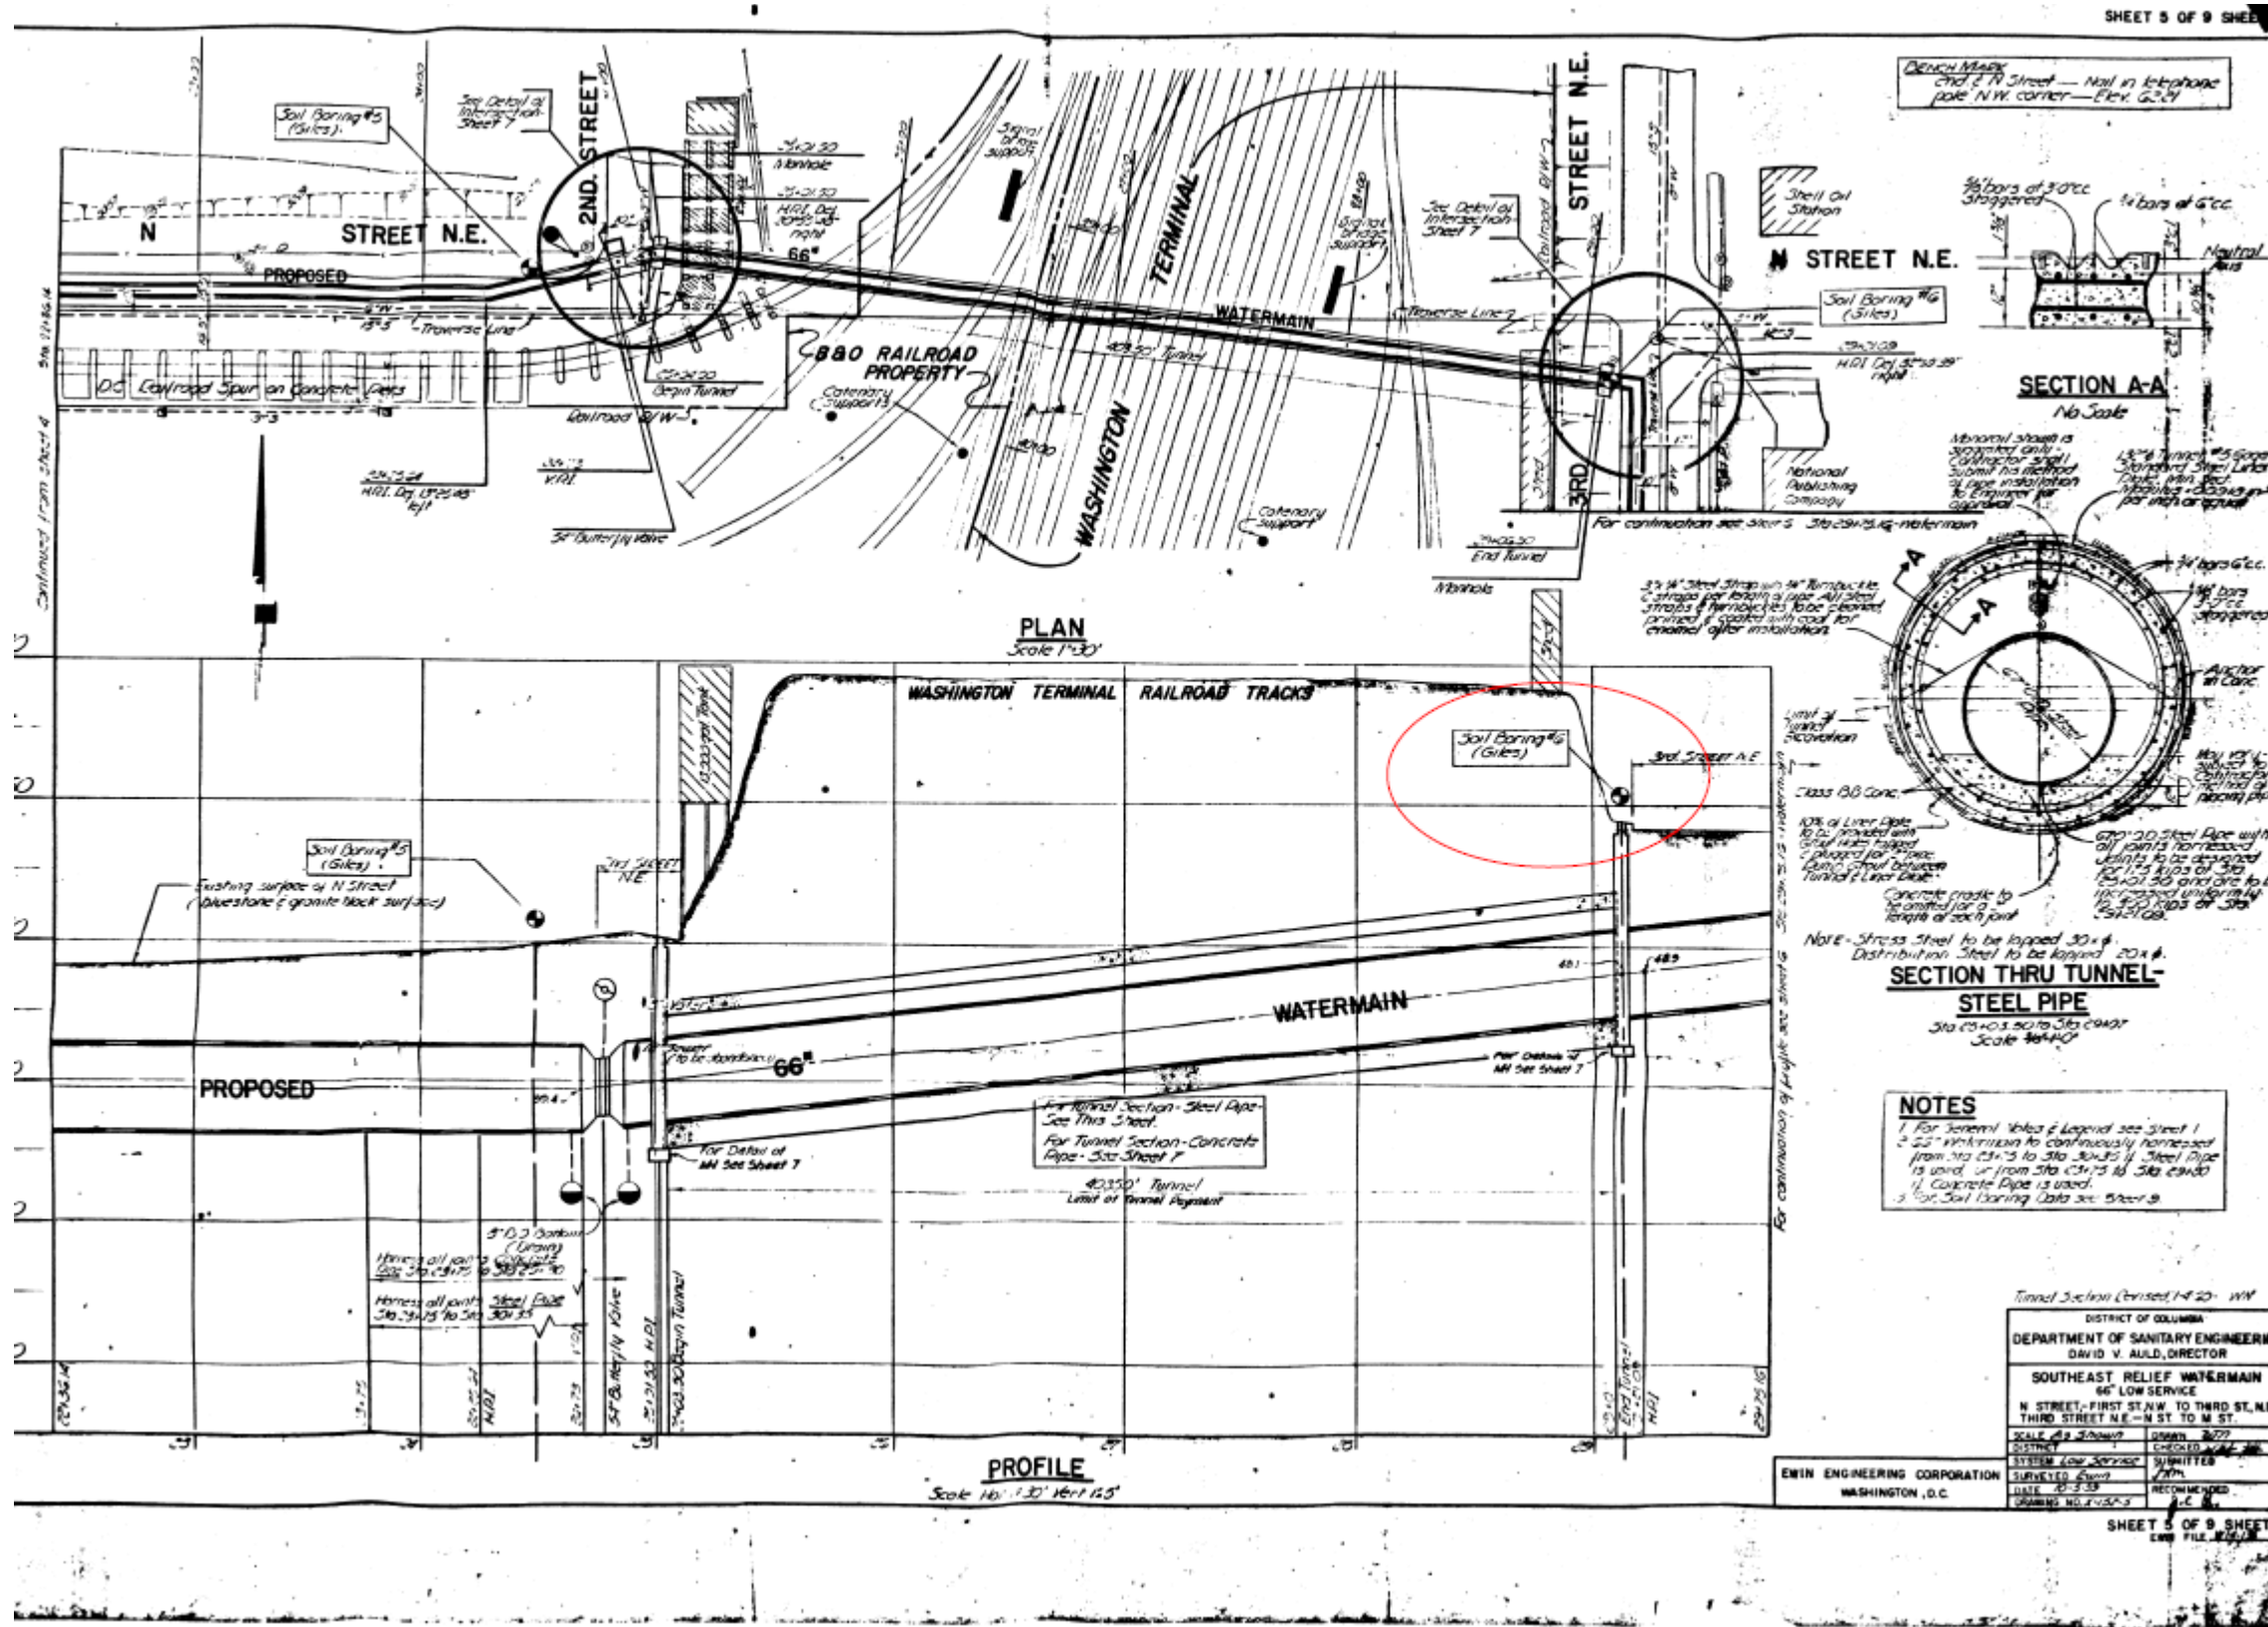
Geotechnical Plan and Borings, 180035 Geotechnical Engineering Report, p. 22
